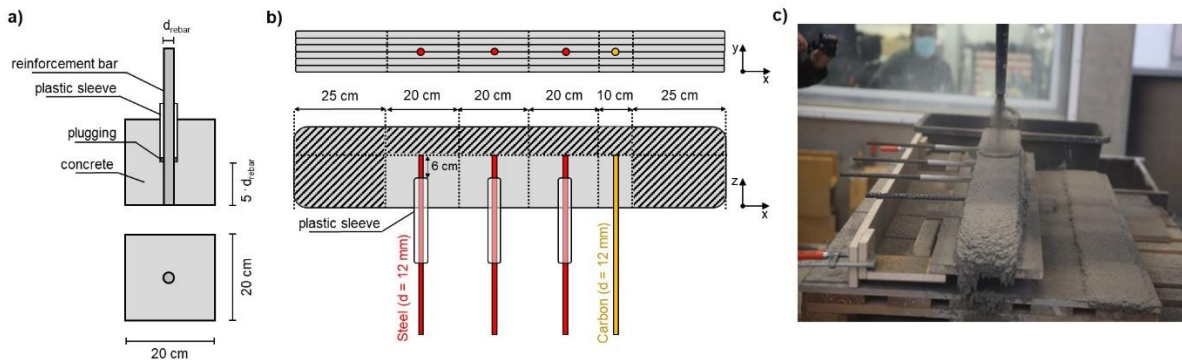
Specimen fabrication; a) Pull-out specimen geometry; b) Visualization of specimen manufacturing using SC3DP; c) Manufacturing process using SC3DP at the DBFL.
